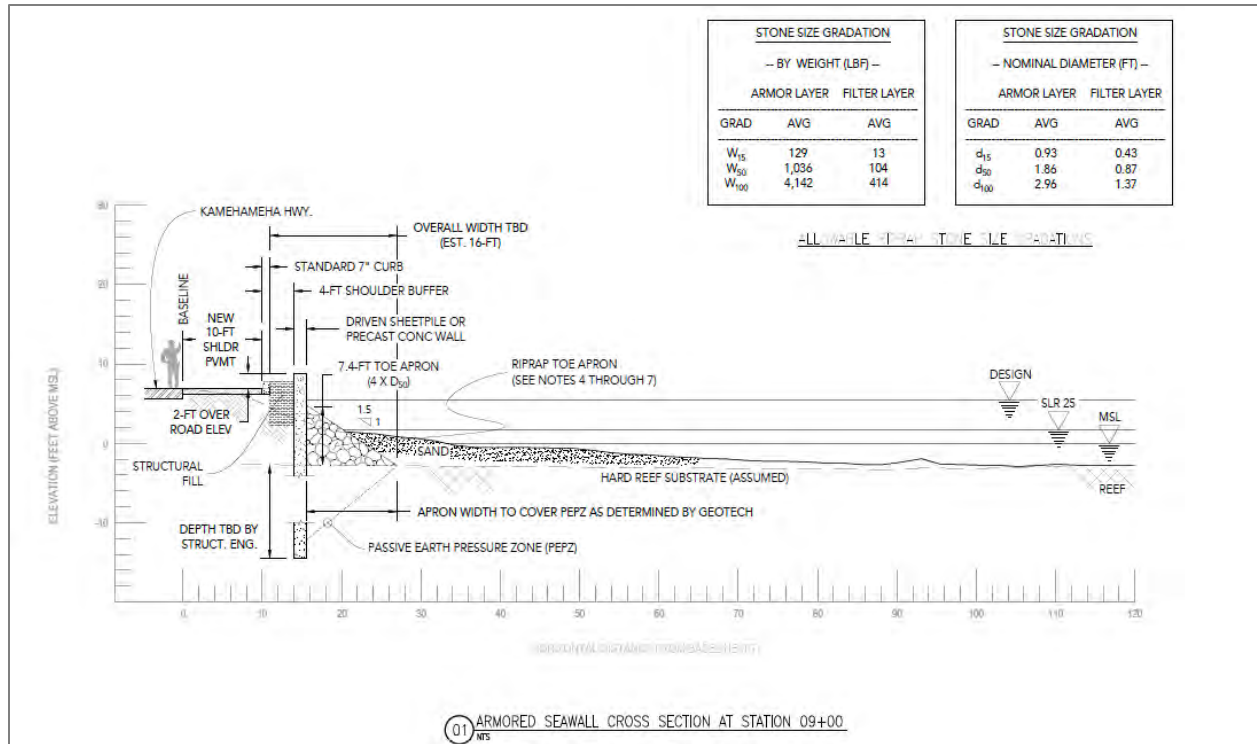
Cross section concept drawing of a proposed hybrid seawall with armor stone apron.
